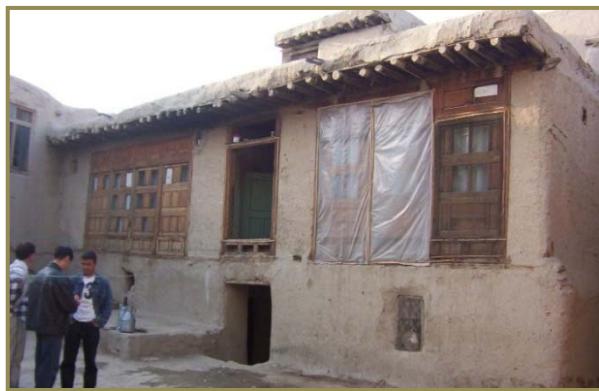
Traditional overhang constructed to provide shade as well as to protect the house windows and outer mud walls from the rain. (Photo by the author)
